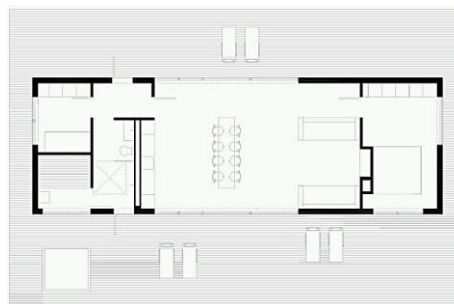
Villa Wallin / Erik Andersson Architects (<http://www.archdaily.com/366357/villa-wallin-erik-andersson-architects>).
